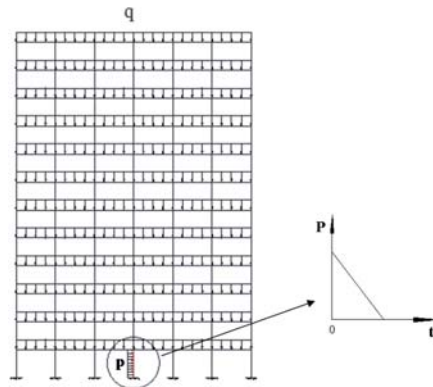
A 2D Steel Frame subjected to Blast Loads on a Ground Floor Column
